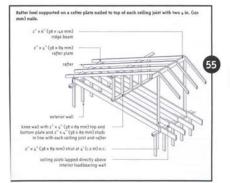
Critical structural details: roof trusses (Source: CMHC 2001)
